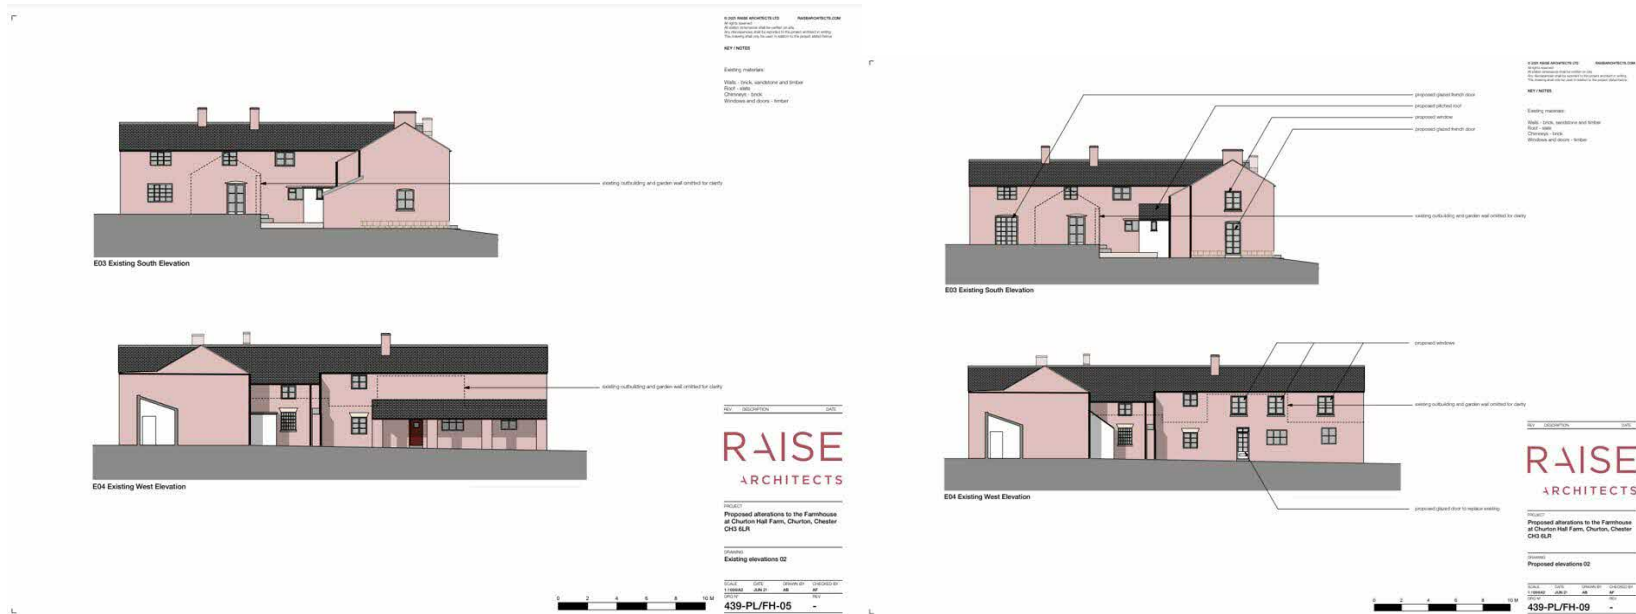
From left to right: - Existing and proposed elevations – south and west. (Copyright: RAISE architects)
